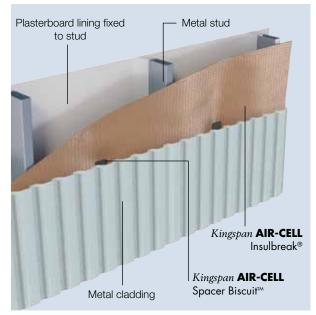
Kingspan AIR-CELL Insulbreak® on steel-framed wall
